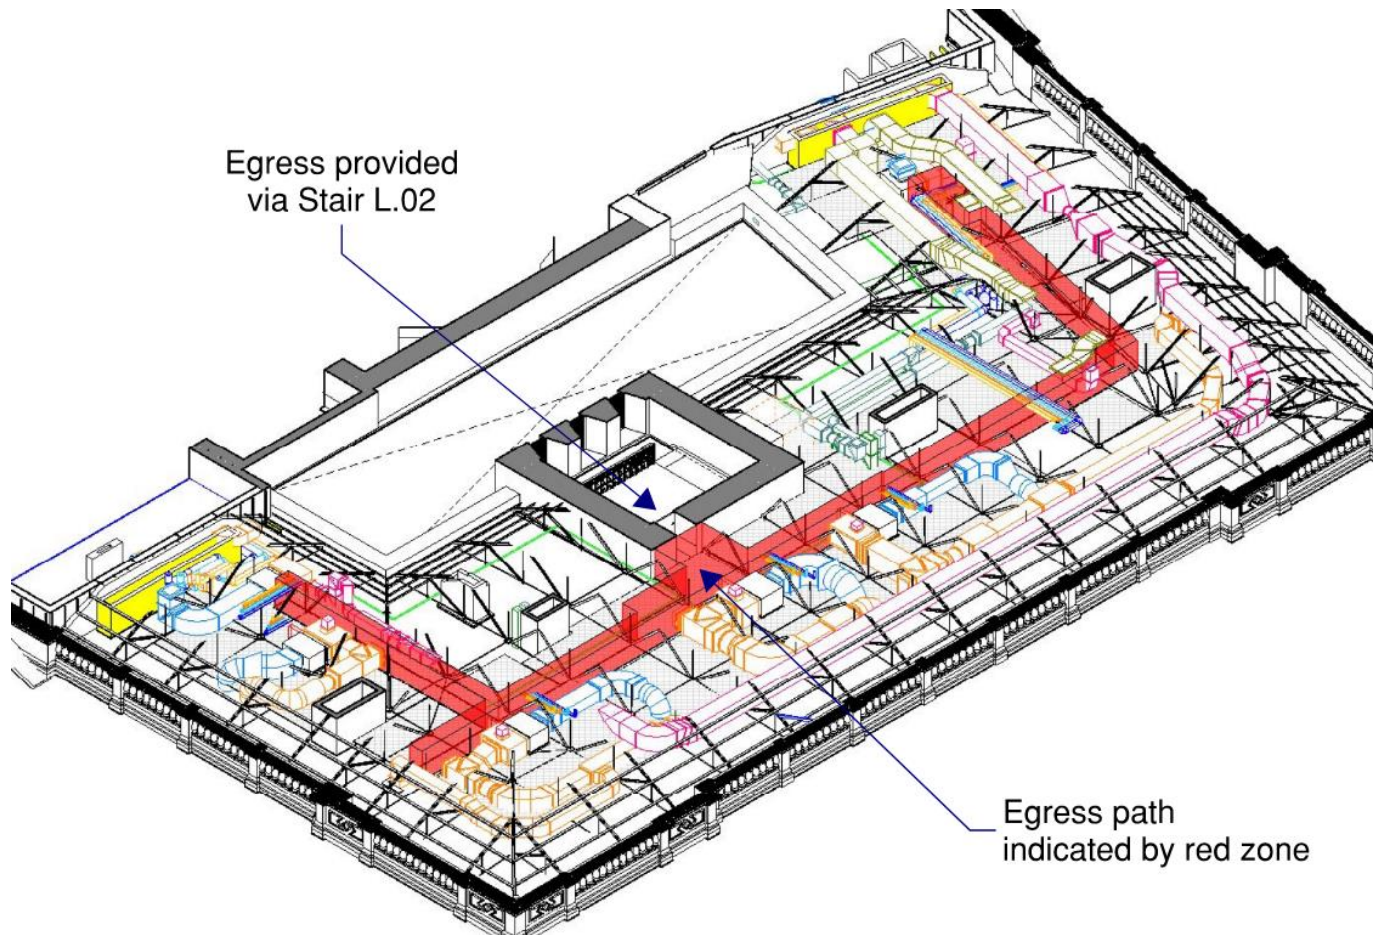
Egress path through southern roof space, indicative of north roof space – Level 03 perspective
